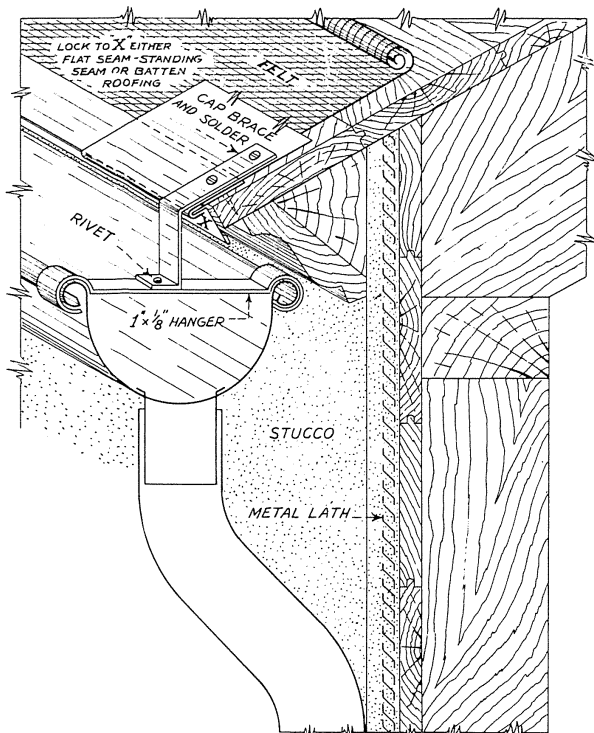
DOUBLE BEAD EAVE TROUGH WITH HANGER FOR FLAT SEAM, STANDING SEAM AND BATTEN ROOF INSTALLATION
